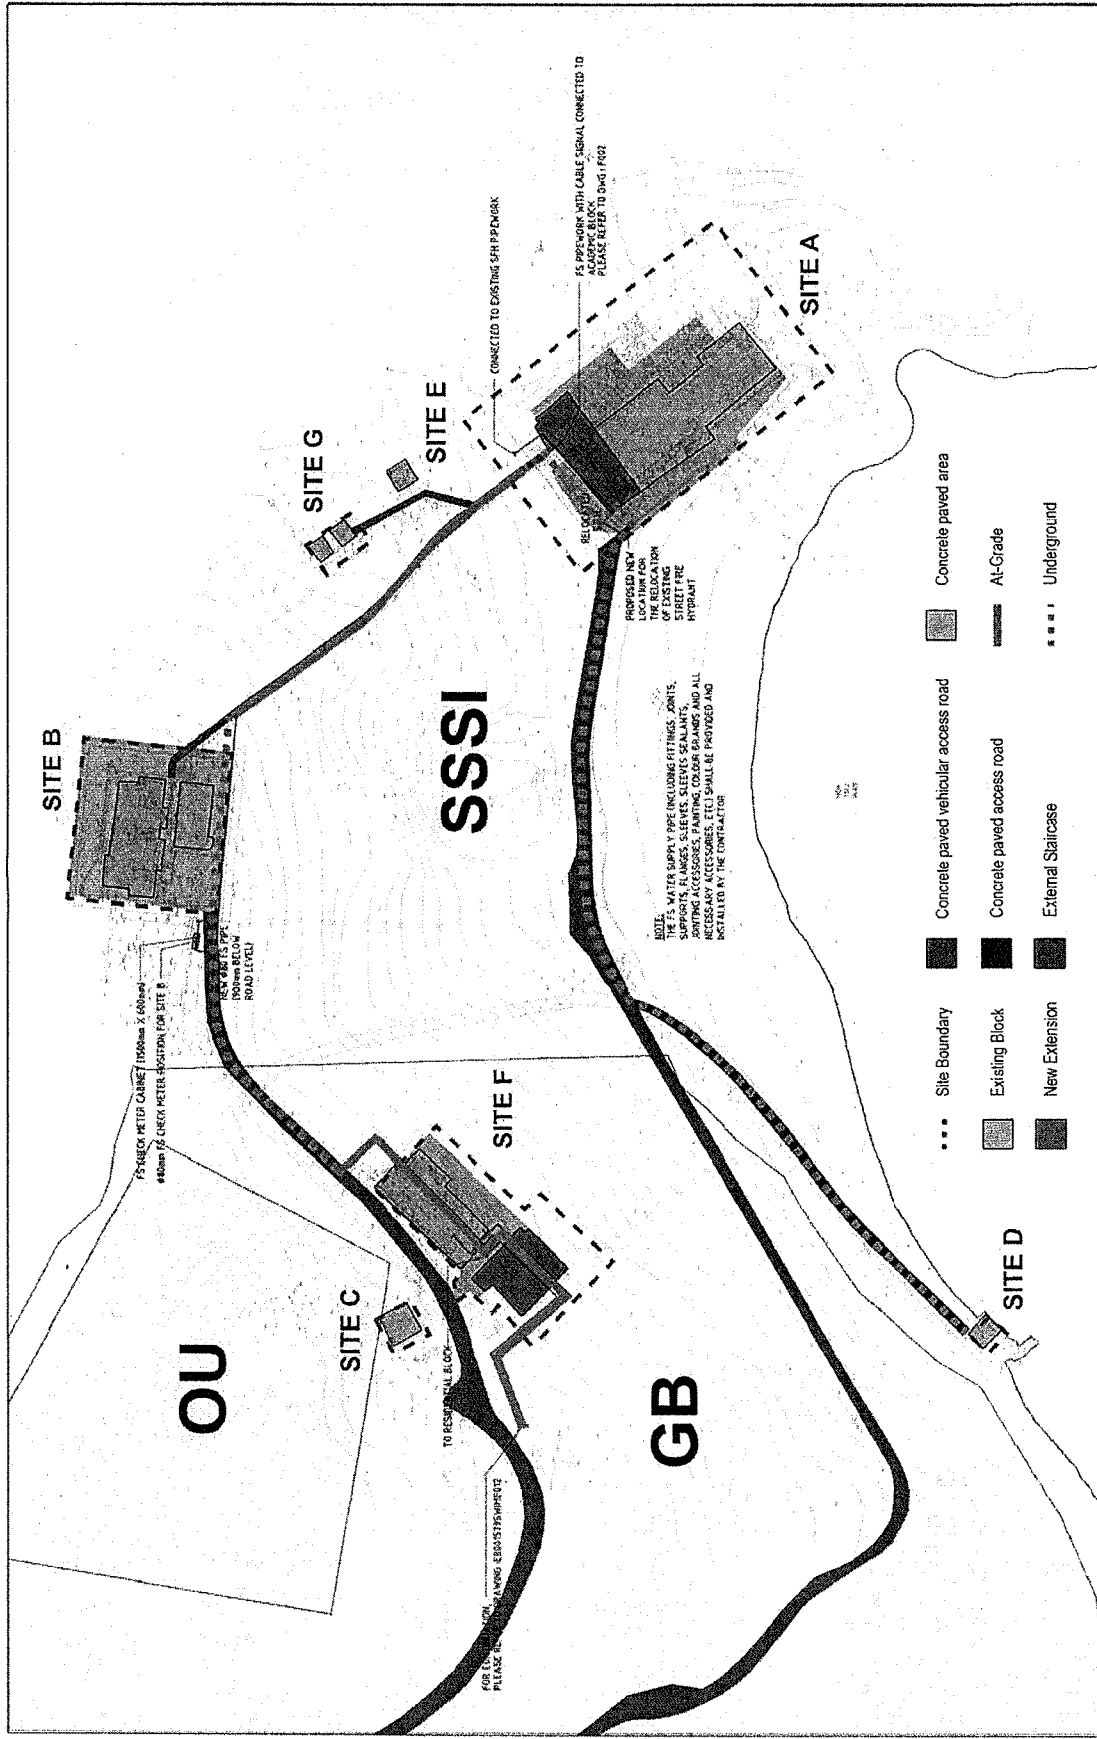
Layout Plan Describing the Arrangement of Fire Services Water Pipe within SSSI with Alignment
